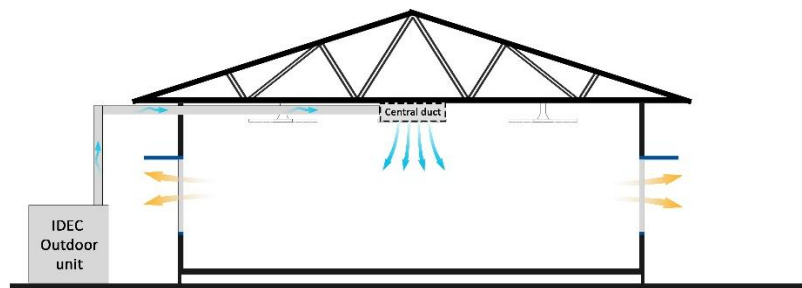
Conceptual section showing layout of the cooling system for IDEC system in a cooling center (temporary structure)
